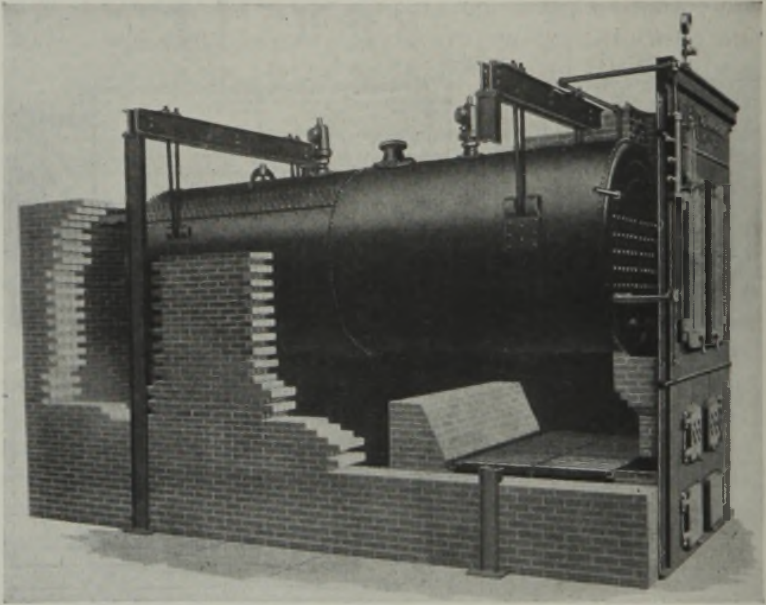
Brick setting for fire-tube boiler with full-front setting.
